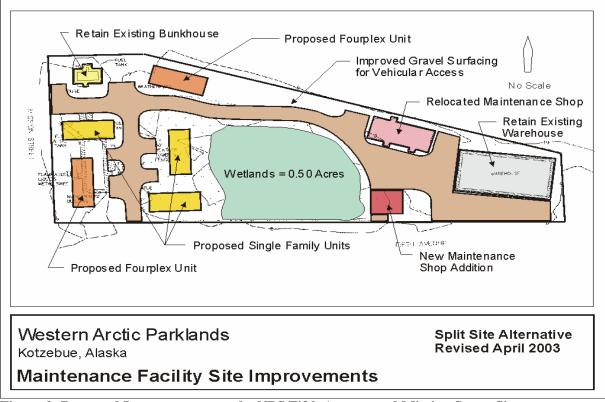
Proposed Improvements to the NPS Fifth Avenue and Mission Street Site
